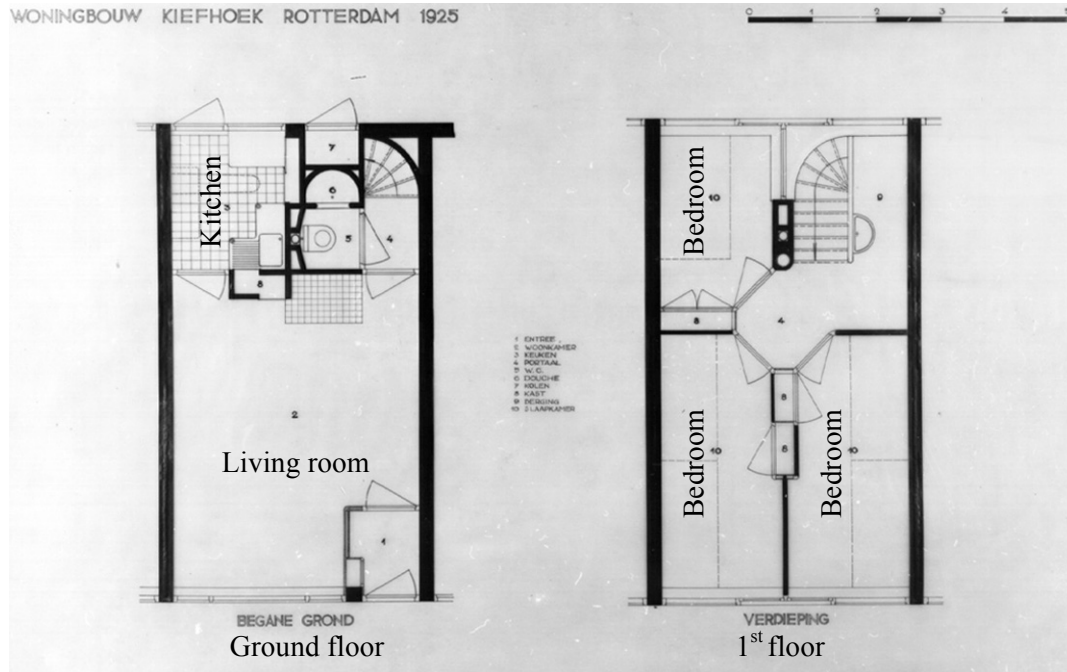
Workers Housing, De Kiefhoek, Rotterdam, 1925, plan layout
